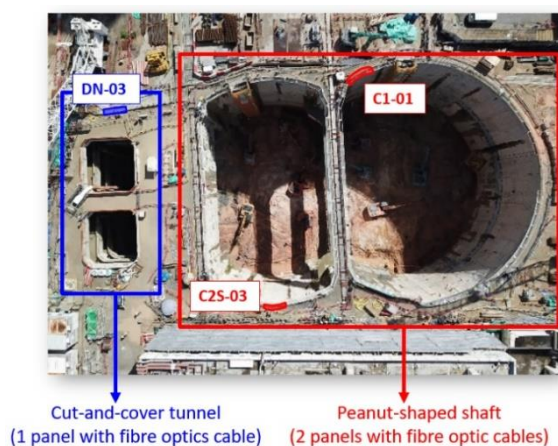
General view of the TBM launching area showing diaphragm wall panels with fibre optics cables instrumented
